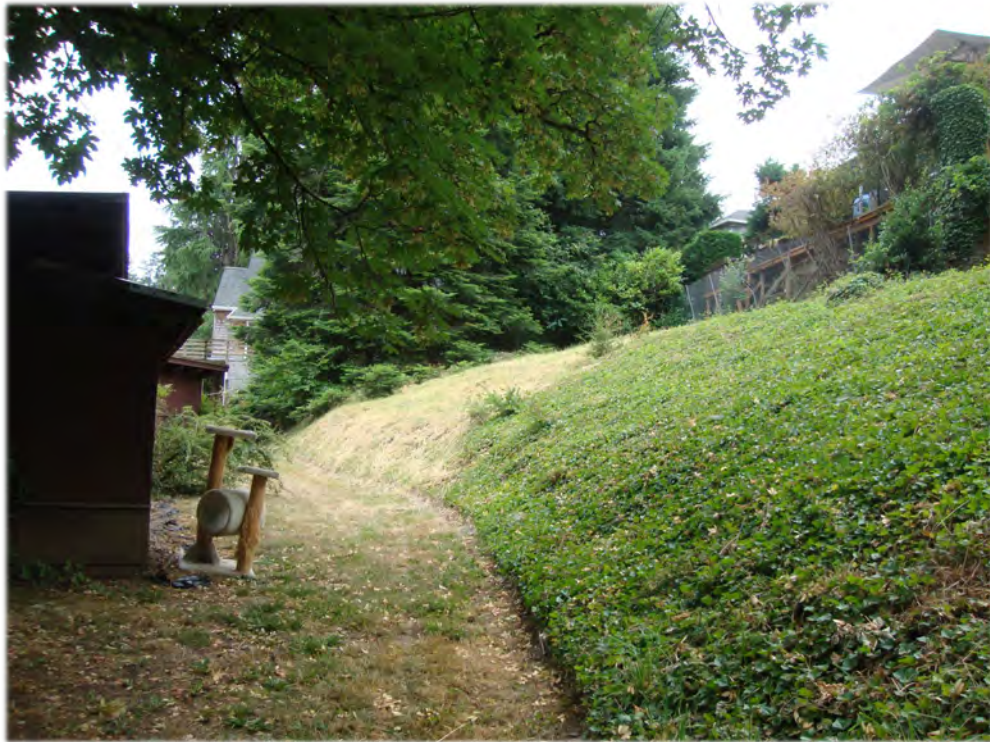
From the northwestern site corner facing south along steep slope behind the existing residence.
